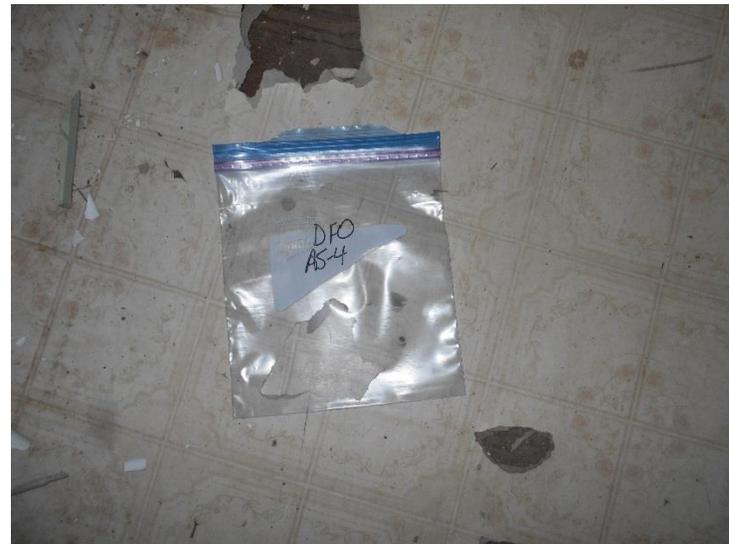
View of bulk sample CA-AS-4 (beige and brown pattern vinyl sheet flooring).
